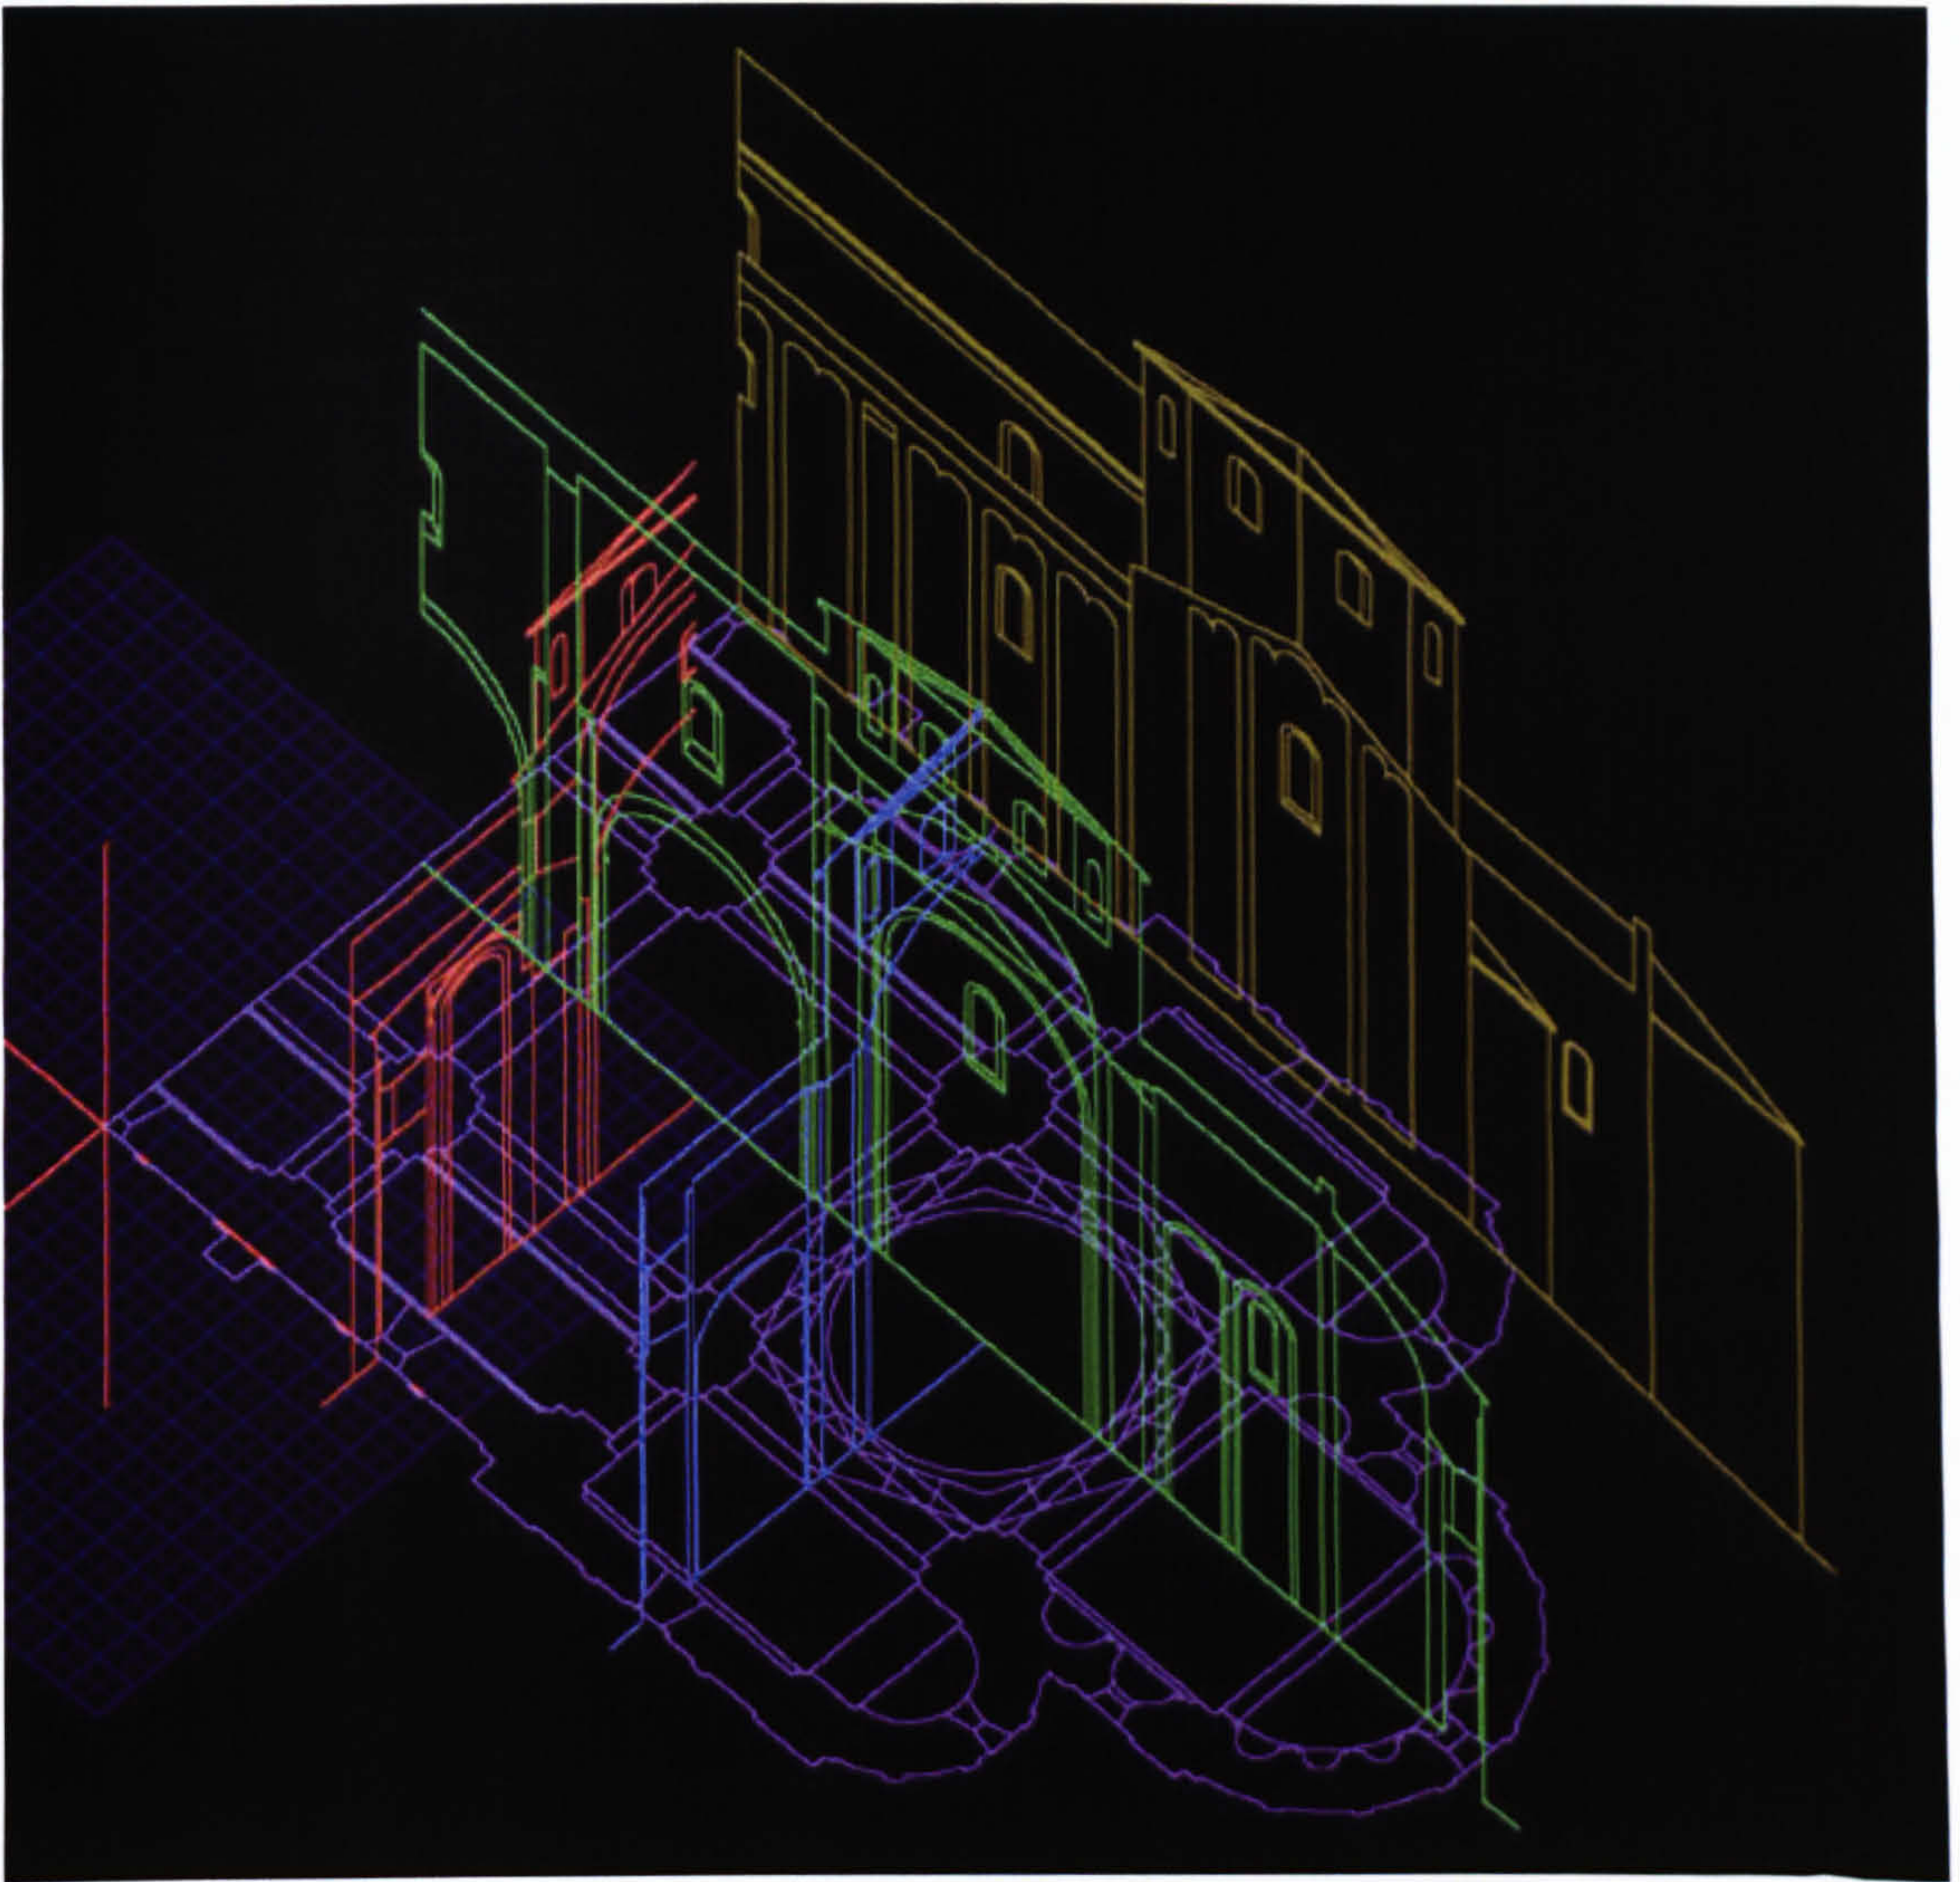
3-D skeleton incorporating plans, sections and elevation, used as a framework for the computer model
